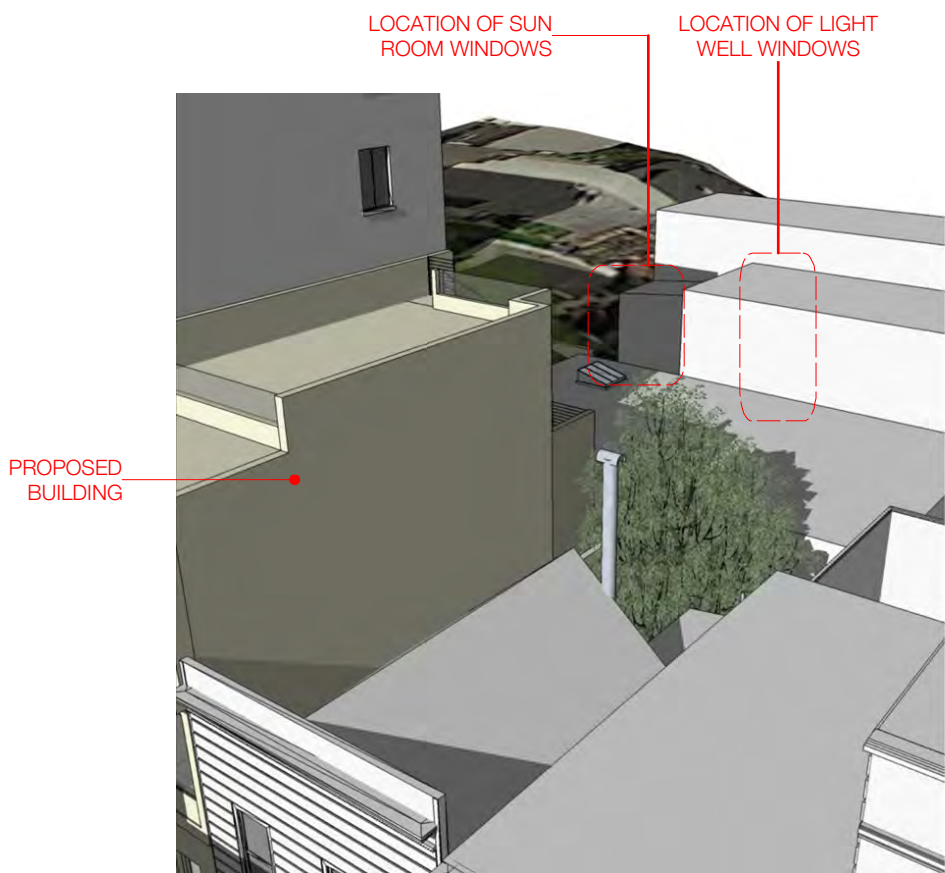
PROPOSED SHADOWS - SEPT 1ST, 4:00PM
